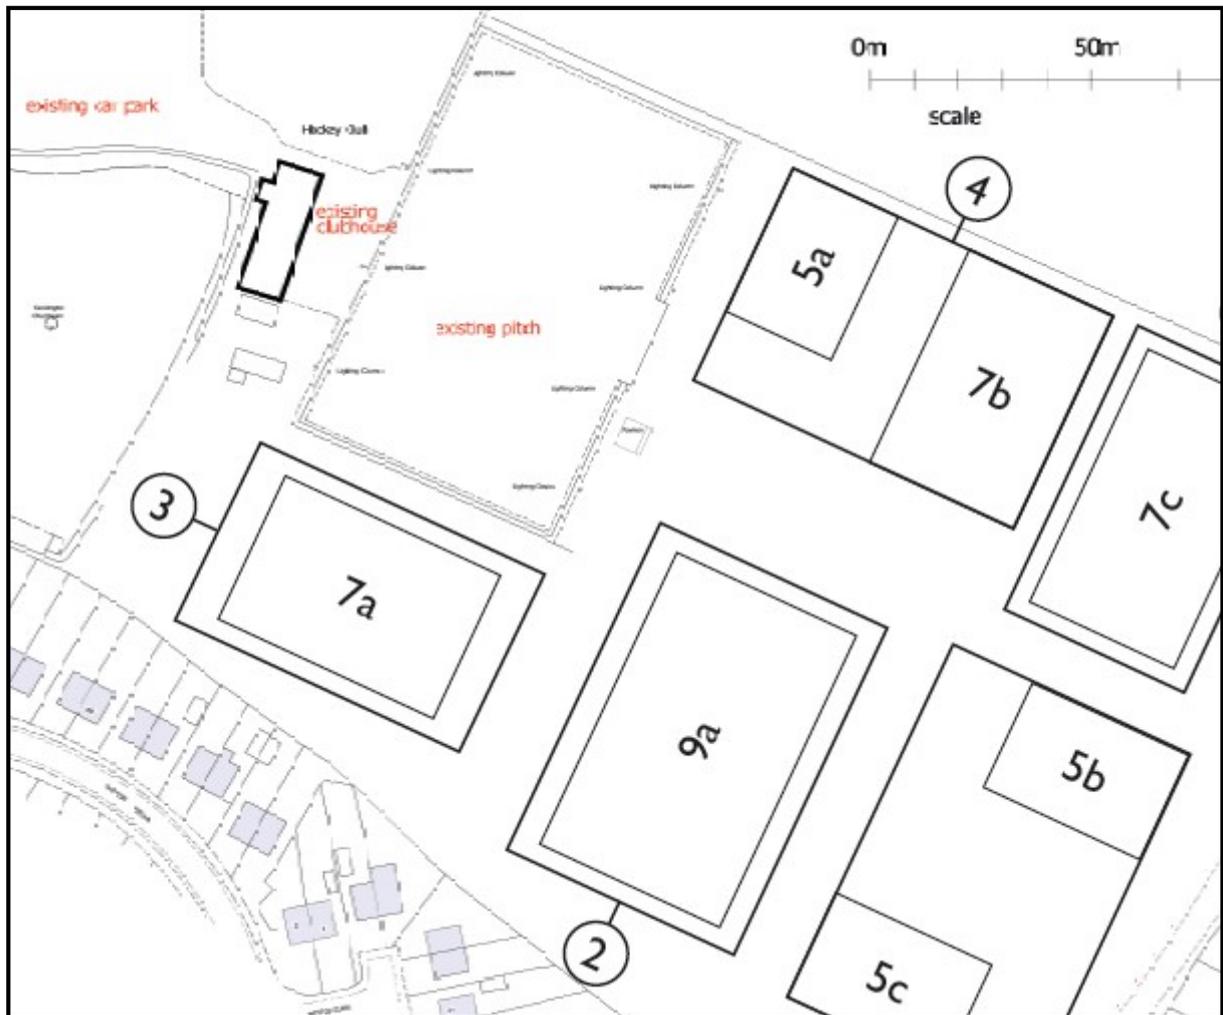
Existing wider Hockey Club Site Layout with pitches marked
